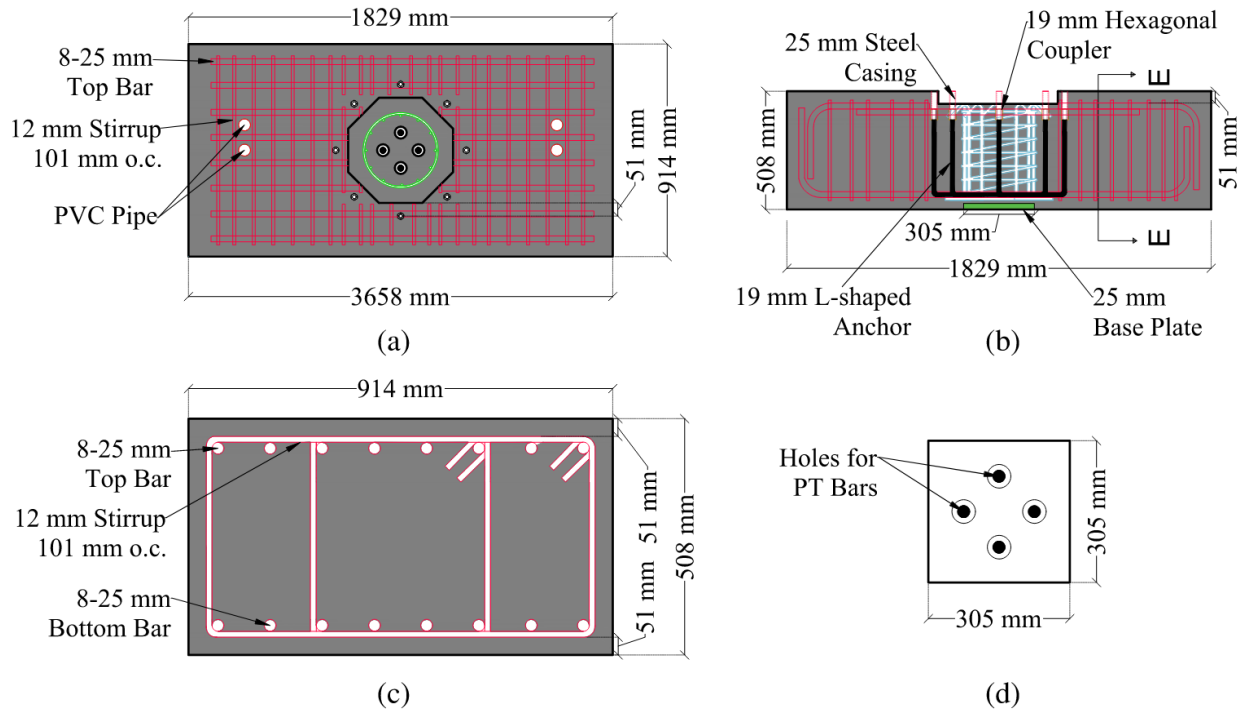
Footing details: (a) footing plan; (b) footing section in longitudinal direction; (c) section at E-E; and (d) 25 mm thick steel base plate for anchorage of PT bars.
